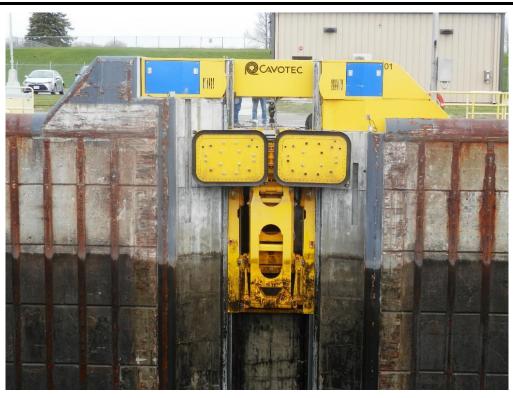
Hands-free mooring Eisenhower Lock elevation view
